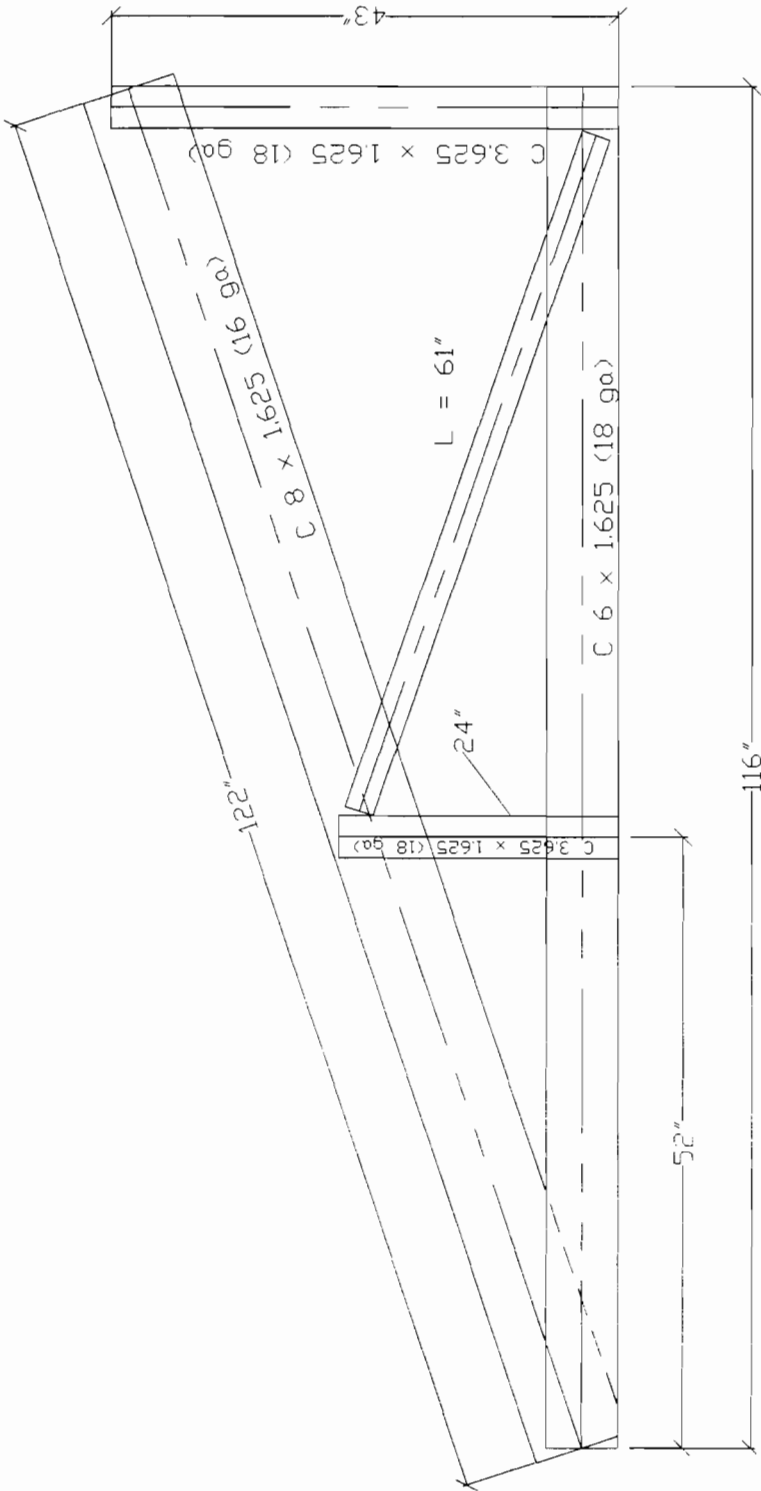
DETAILED DRAWINGS OF TRUSS ASSEMBLIES
